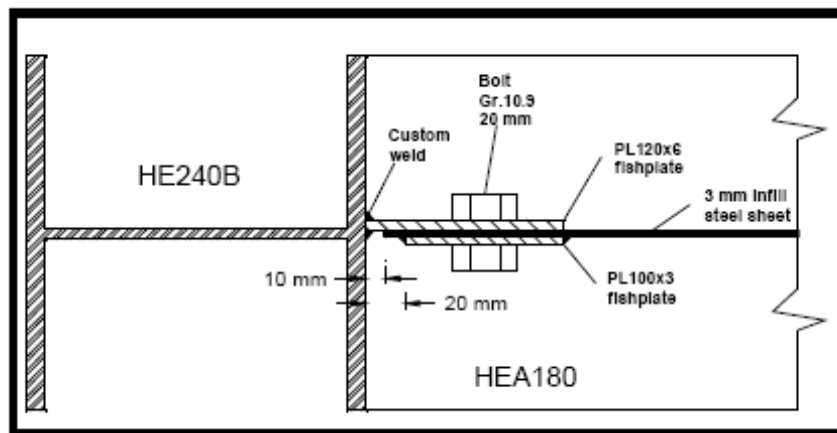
Typical fish plate to frame and infill plate to fish plate connections
